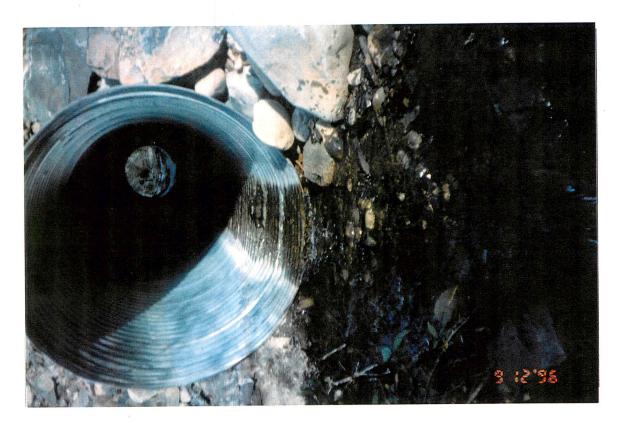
, 12-Sep-96 Site #: A14, Upstream view through culvert.
